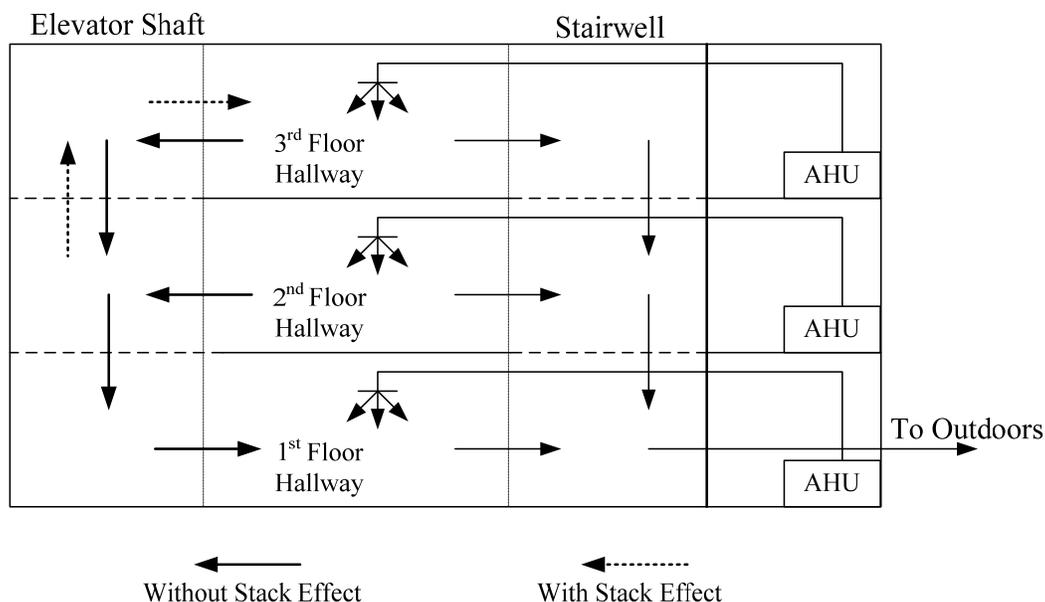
Elevator shaft and stairwell airflow direction schematic for the floor-by-floor zoning systems in winter condition
